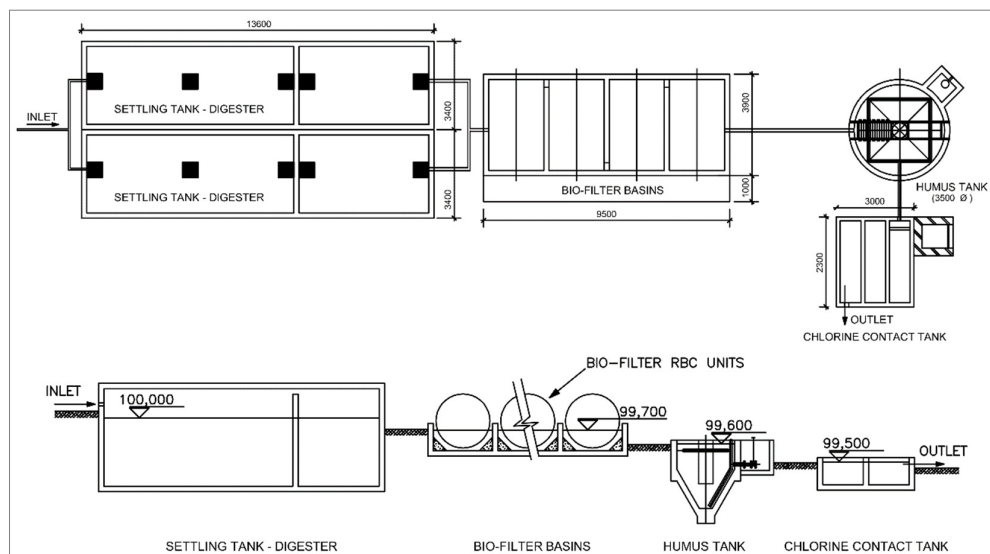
Plan view and section of typical 200 kl/d RBC treatment works
